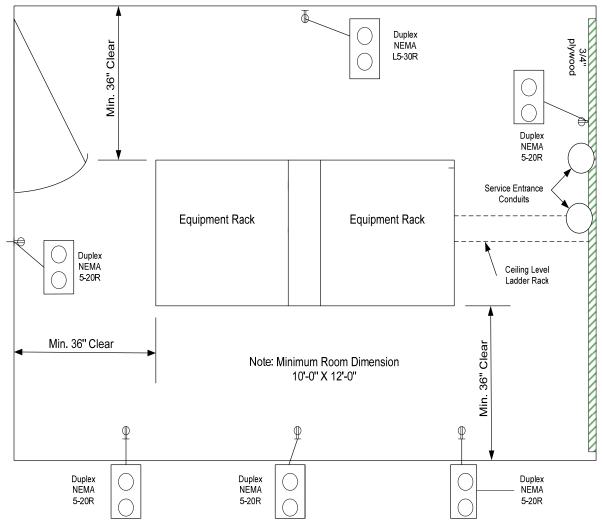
Typical Space Plan for "MDF" Technology Support Area (N.T.S.)
